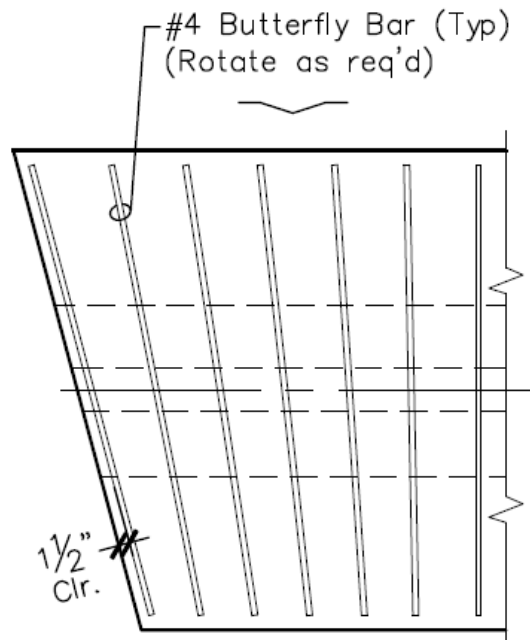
Typical bottom layer of flange reinforcement at end of girder – plan view.
